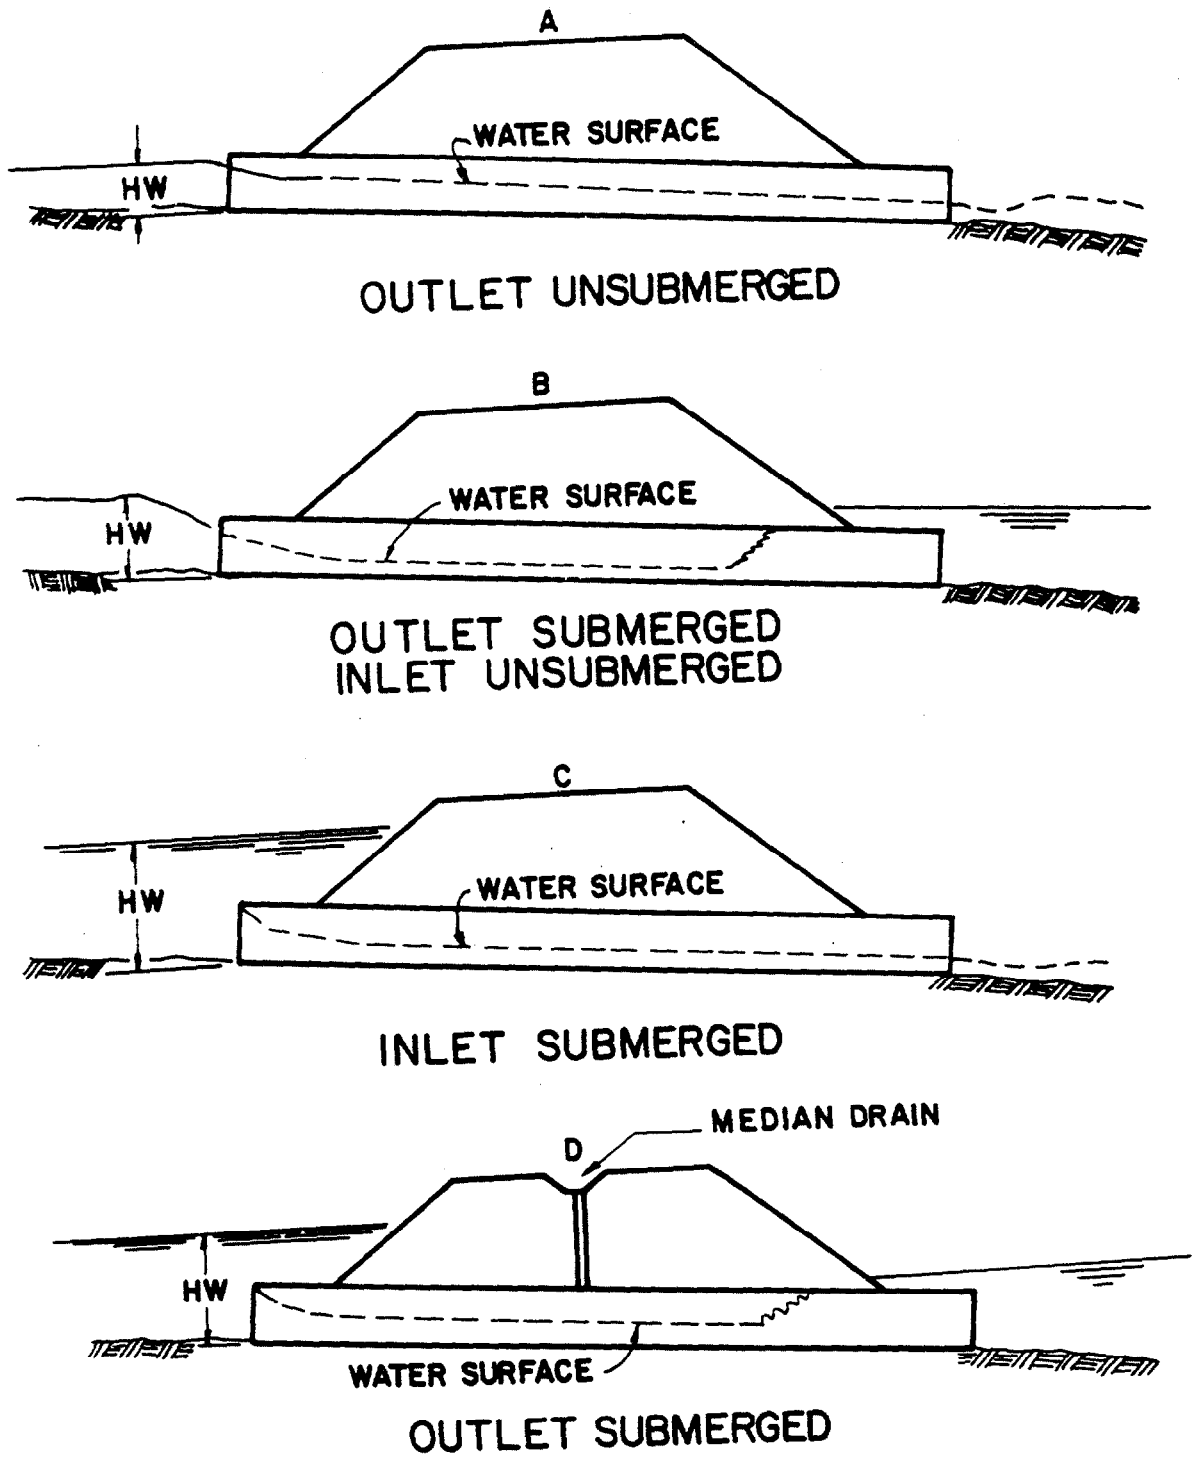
Typical culvert section under inlet control.<sup>(11)</sup>
